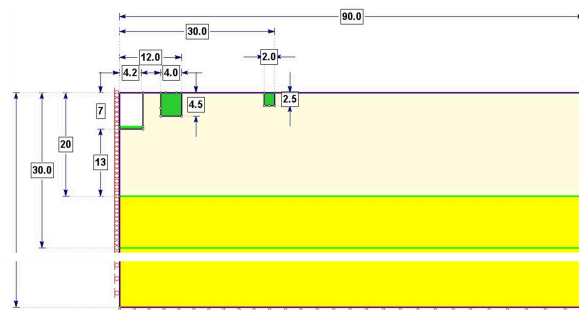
Design example. Foundation with a pier and two foundation rings on recessed on a fractured igneous rock.
